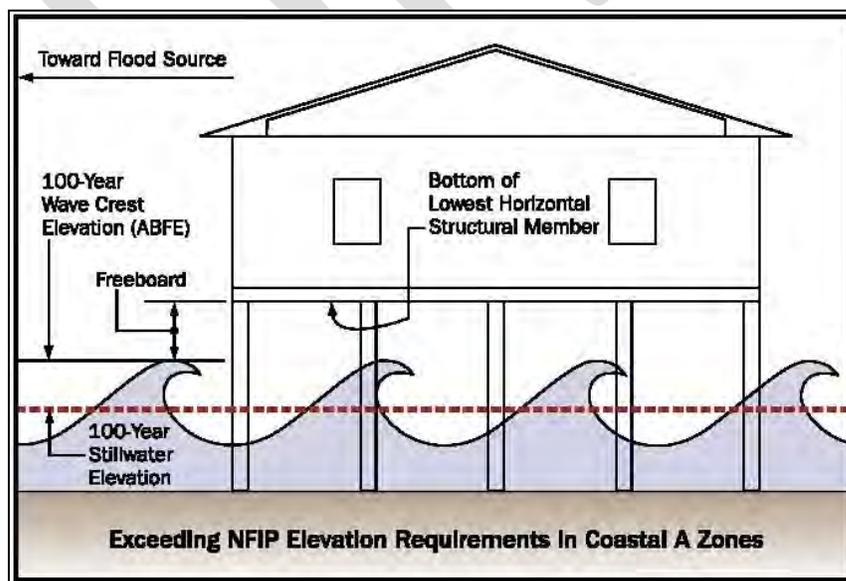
Recommended post-Katrina building standards in Coastal A Zones (www.fema.gov)
